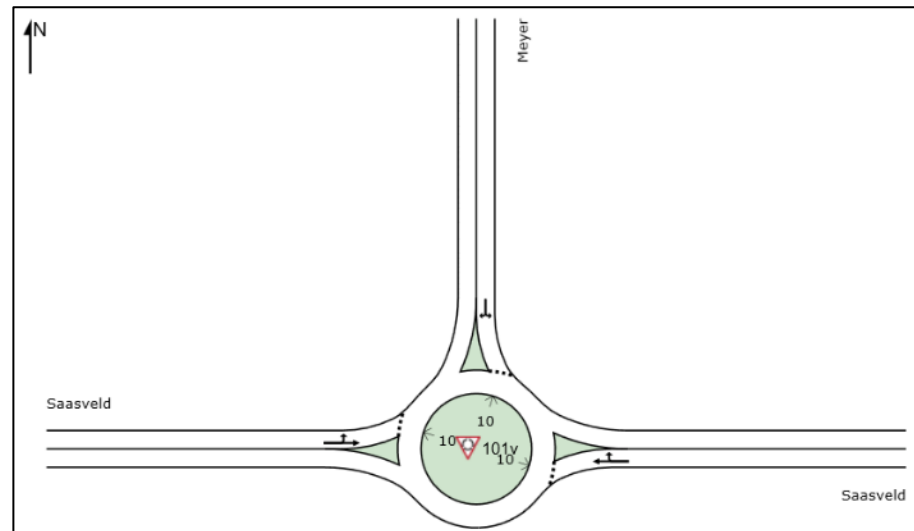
Proposed Layout: Saasveld Road & Meyer Road
